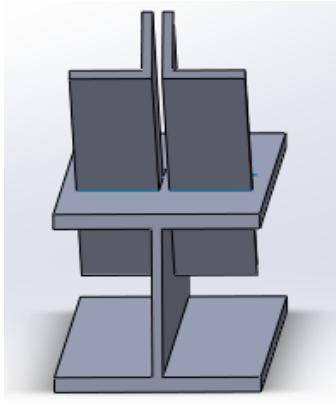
Open section bracing members detail (SOLIDWORKS n.d.).
